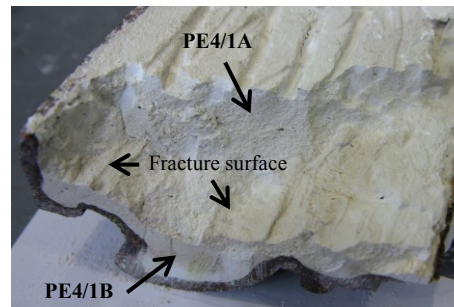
Fracture pattern attesting the existence of a joint surface between PE4/1A and B
